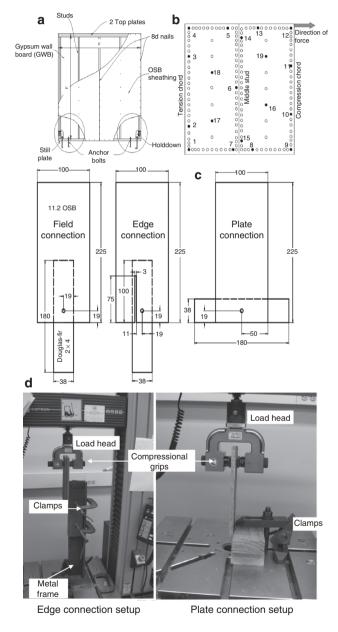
Schematics and photography of some experimental details: (a) shear wall, (b) shear wall cut diagram and fastener numbering, (c) control specimens, and (d) nail connection test set up.
